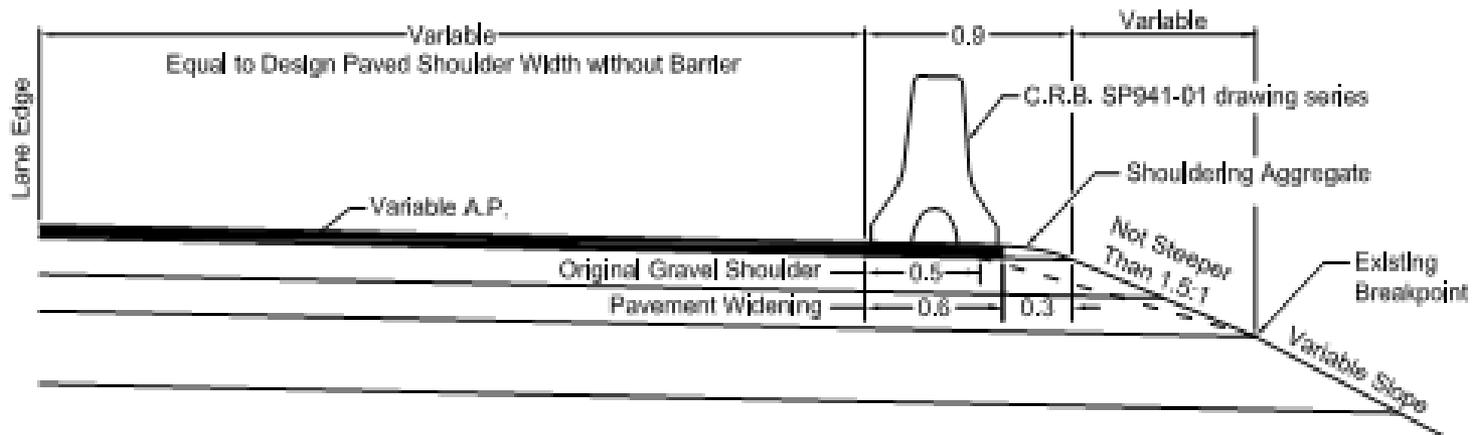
F Shoulder Detail with Roadside Barrier or Drainage Curb
